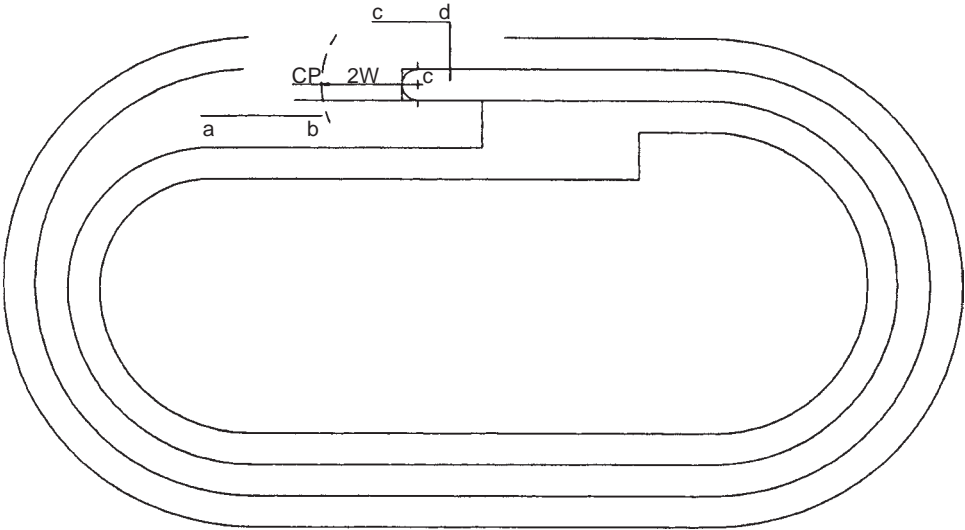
Crest lines and the crest point for bench 2 (Step 3).
